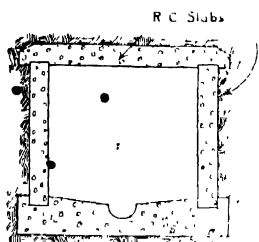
Concrete Culvert with Invert for Dry-weather Flow.
